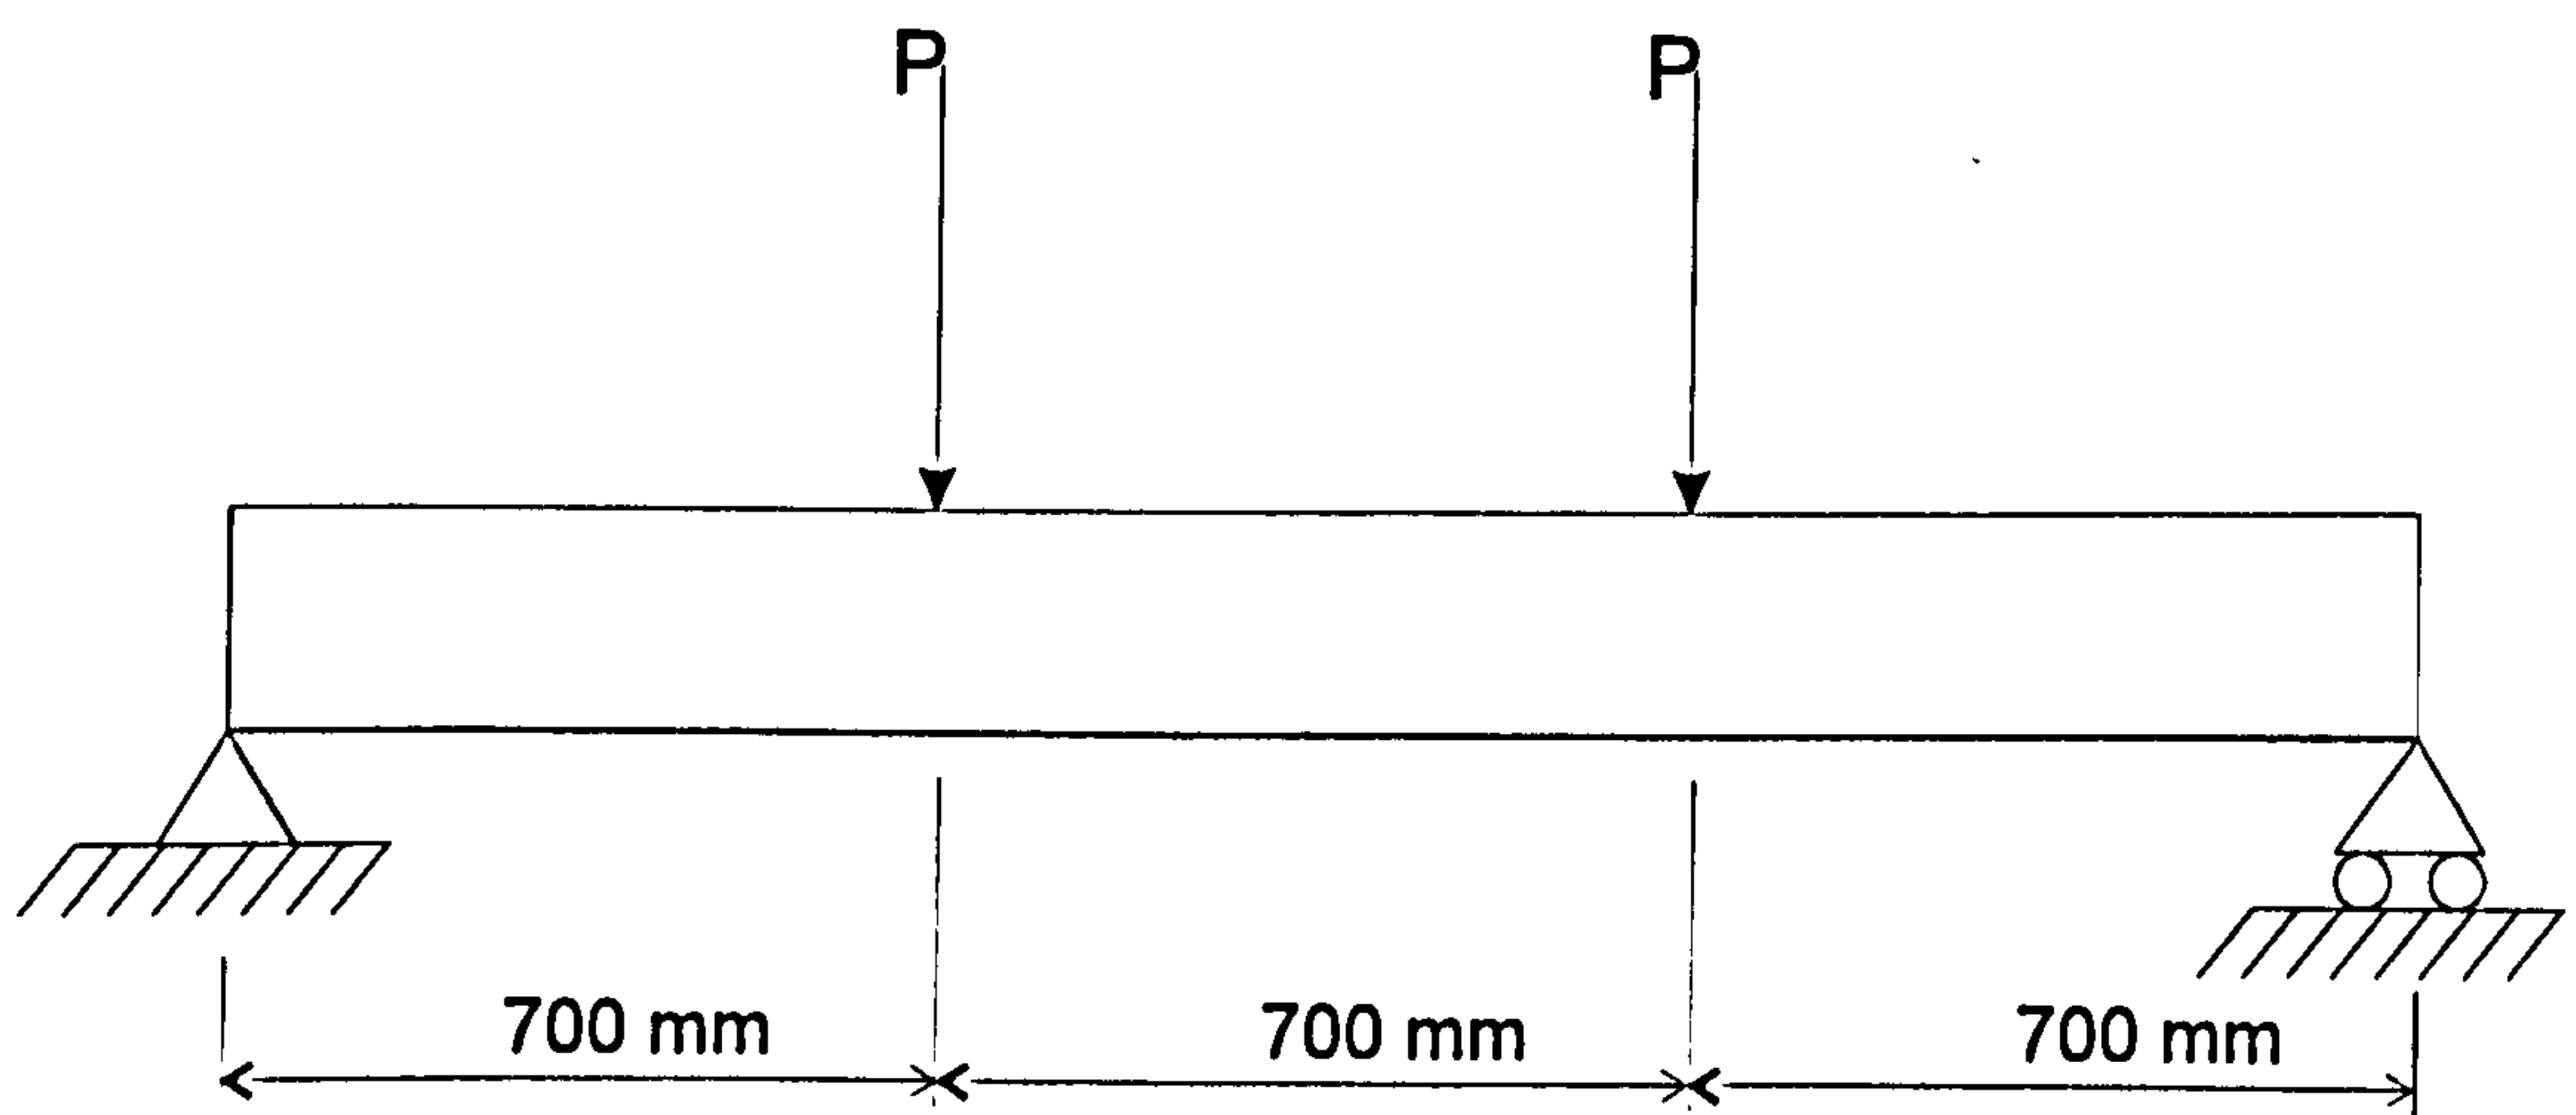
Load Arrangements for Beams 1 and 2
